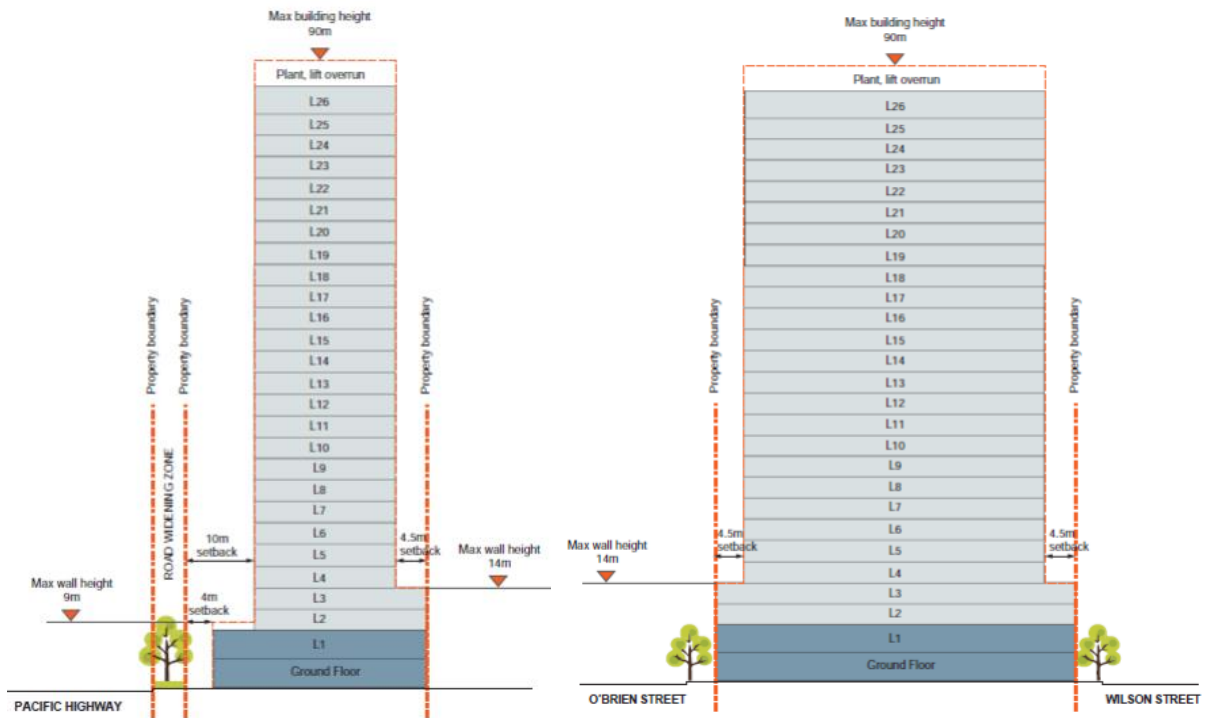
Site Specific DCP Controls showing the building envelopes. (Source: PBD Architects)
